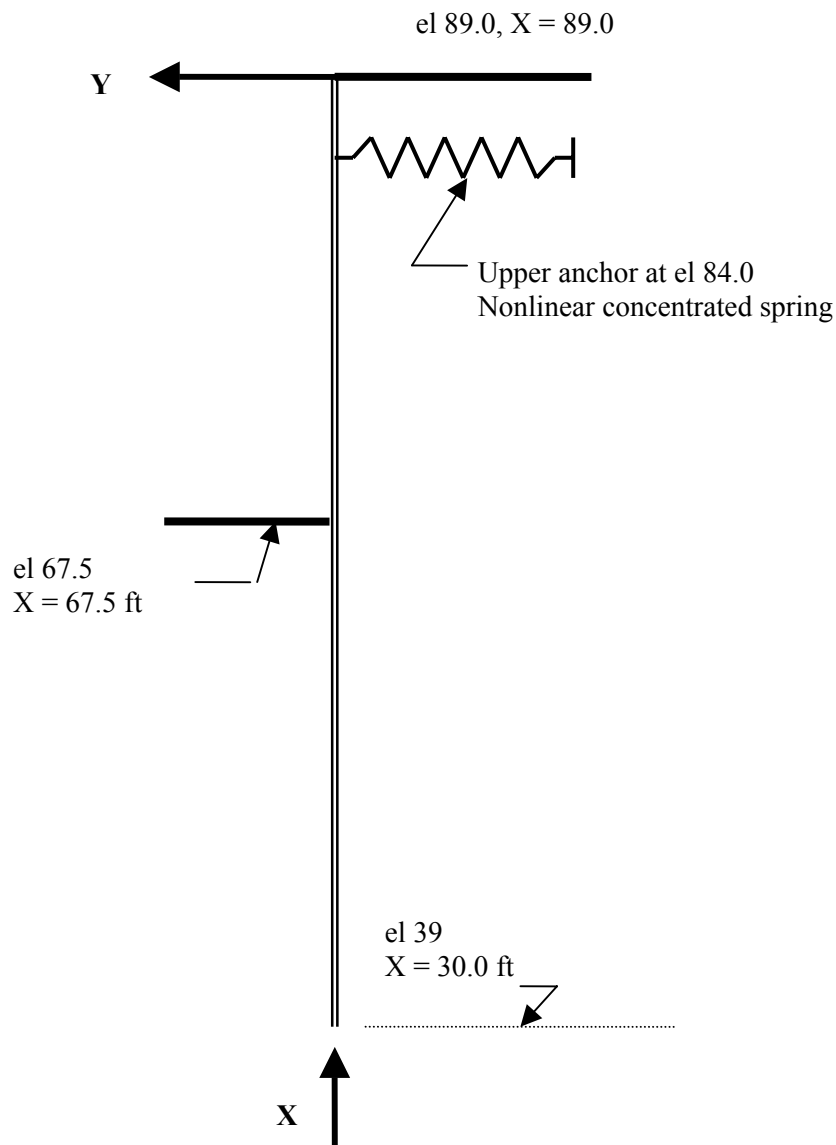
Step 4, excavate to el 67.5, anchor as nonlinear concentrated spring
